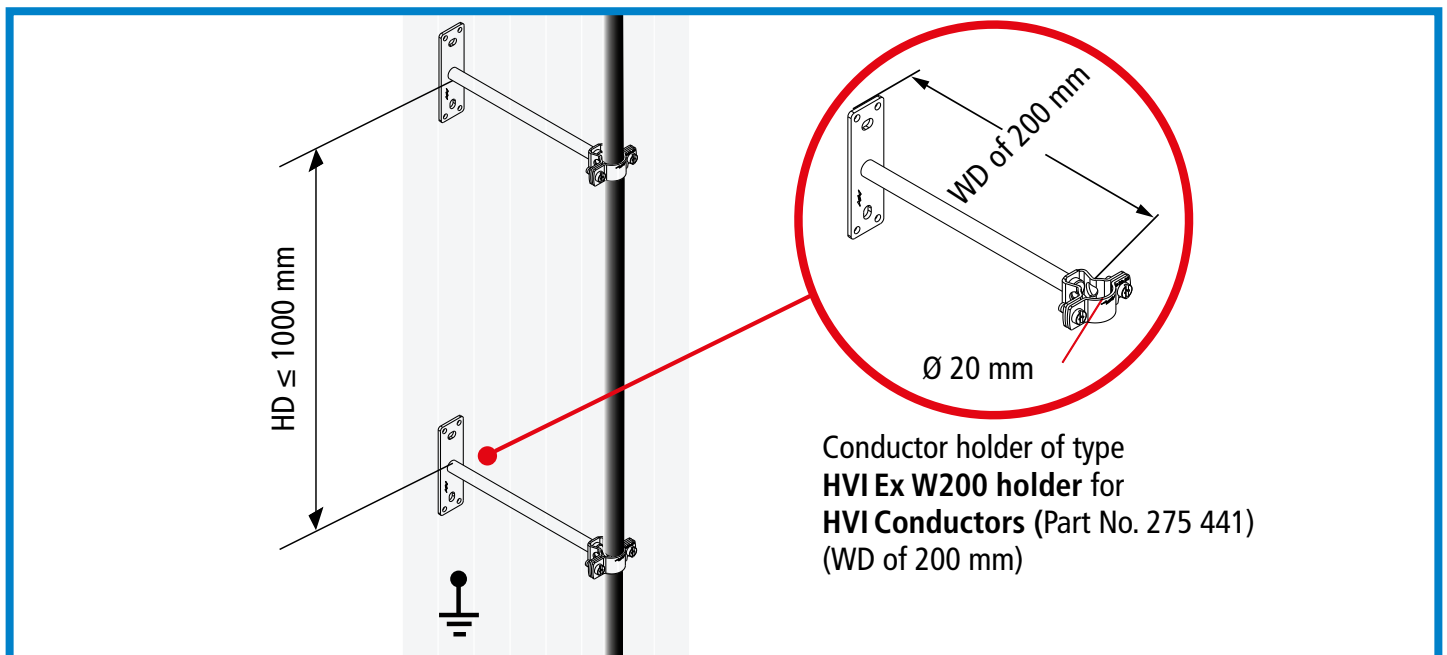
Installation in parallel to an earthed metal façade: holder distance of 1000 mm; wall distance of 200 mm
